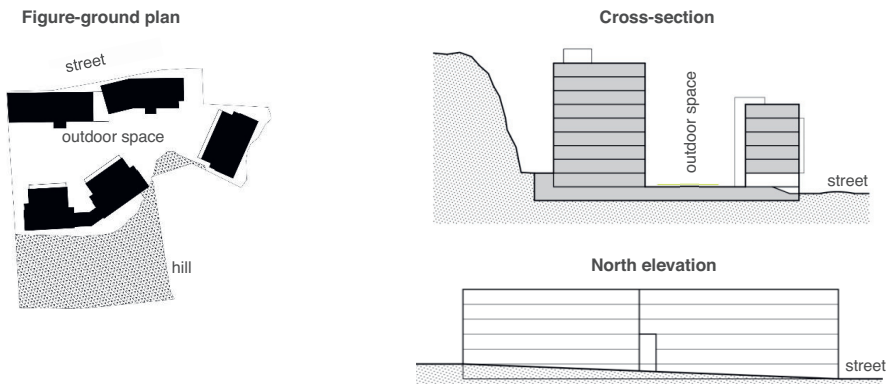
Example of variation of podium type with the lowest storey partly under the ground/above street level – plan drawings (within zoning plan limits), section showing built and outdoor spaces relative to the surrounding street, and north elevation – view from the street; located in Ekebergveien street 5 A–E
